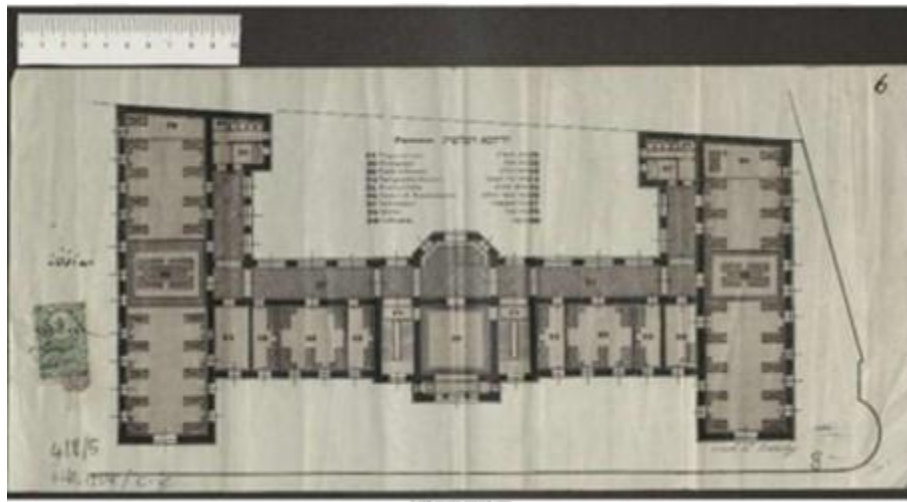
2nd floor plan of the hospital (Source: BOA. İ.HR. 418/5)
